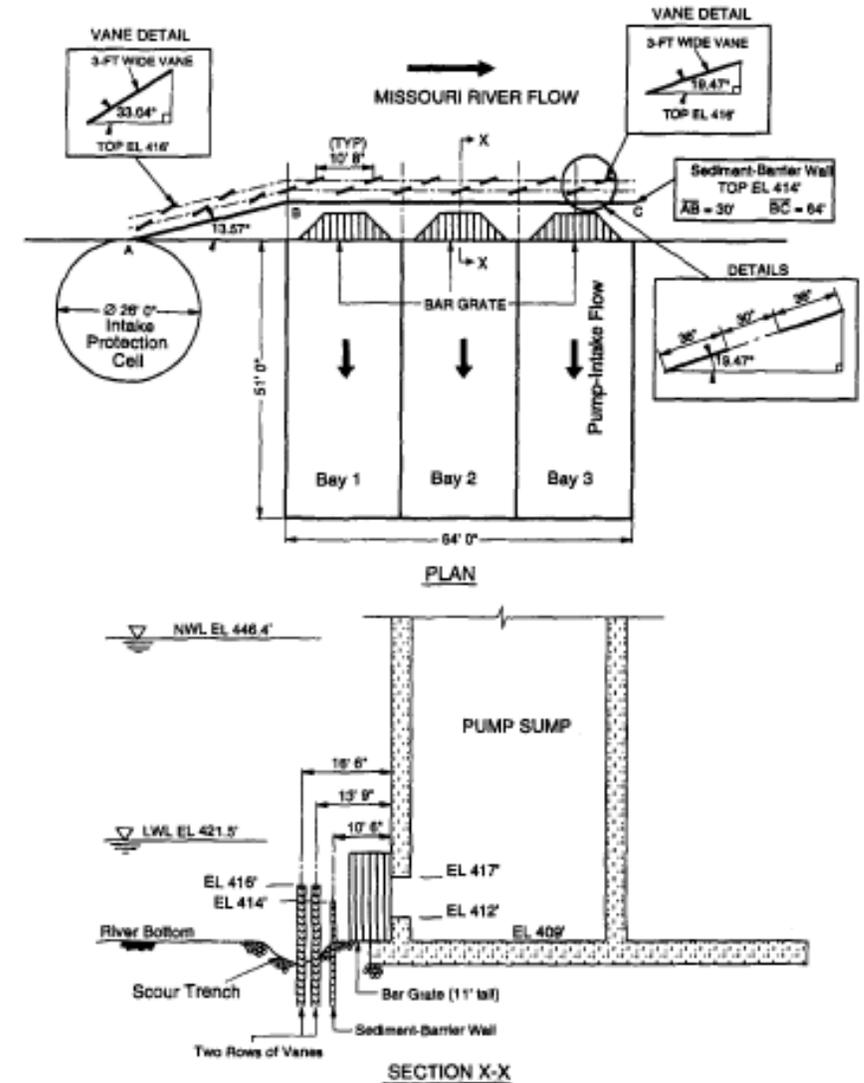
Plan and Section of Sediment-Barrier Wall and Flow-Turning Vanes Developed for Study 3
